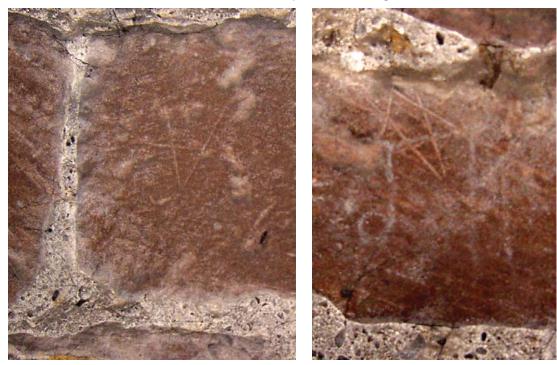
(left) Mason's mark on west elevation of Building 9, within loft of Building 10 Plate 18: (right) Mason's mark on west elevation of Building 9, within loft of Building 10
